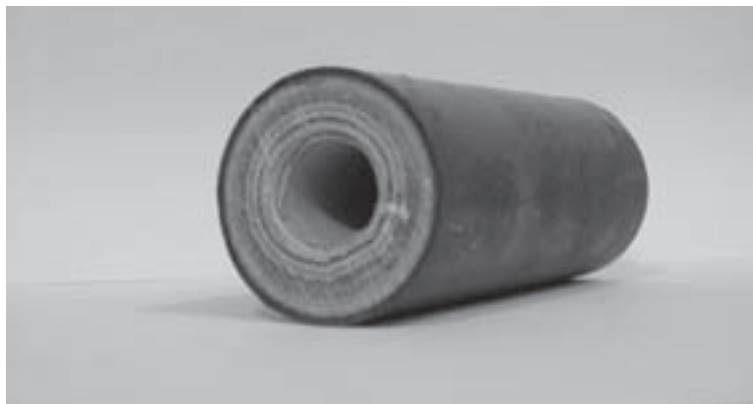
Photo of a 40mm Copper Pipe with Calcium Build-Up
